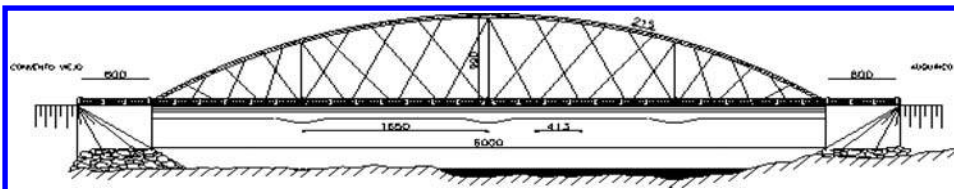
Longitudinal view of San Luis strengthened arch bridge.
